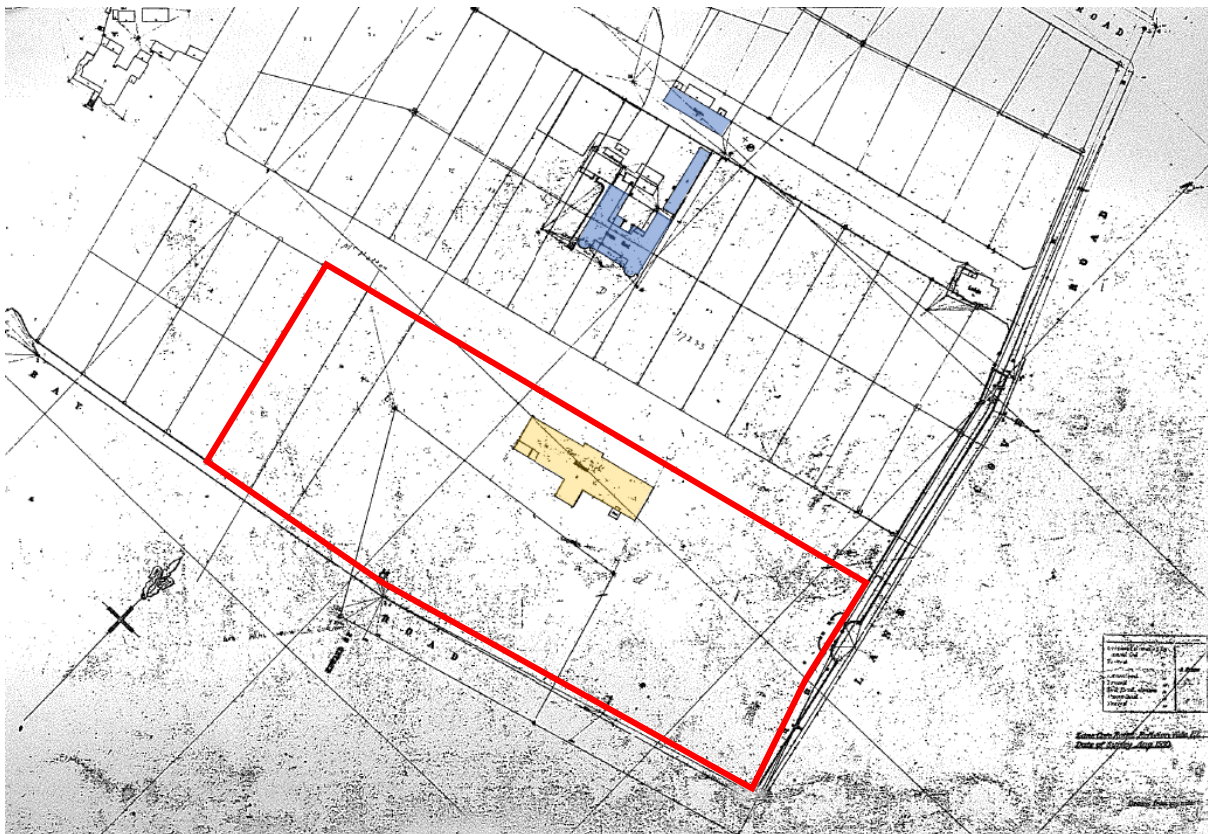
1930 Survey Plan showcasing the Infants School building (yellow) and the former Crow's Nest House (blue). The school building and the current NSPS site boundary (red) are located within the former front gardens of the Estate.
